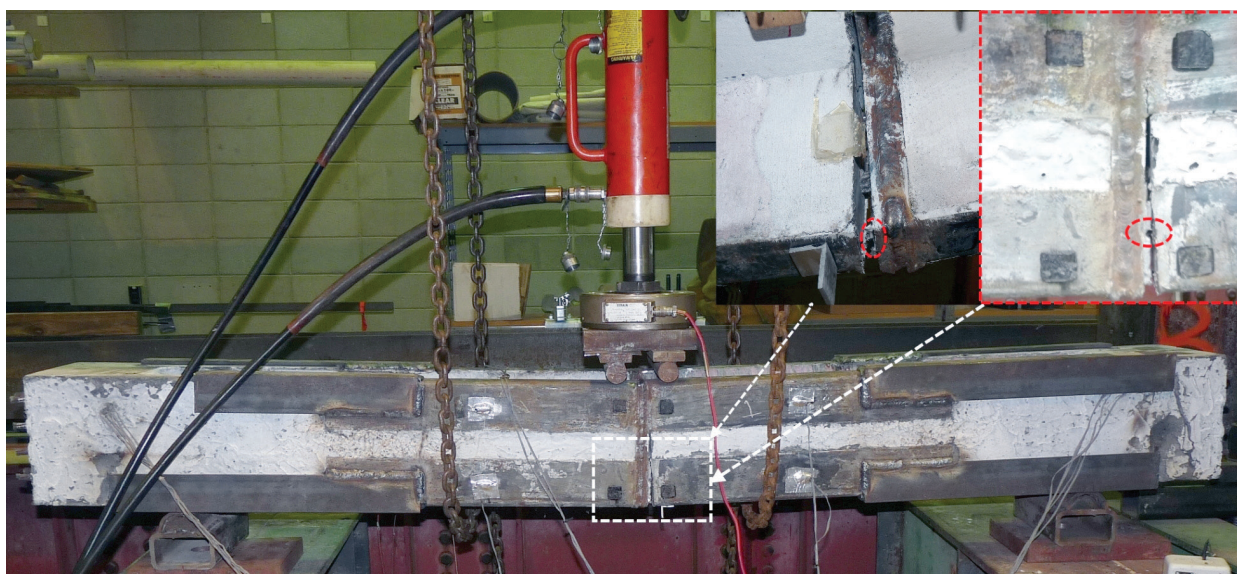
Failure of the test specimen in weak-axis bending and a close-up of the failed welds.
